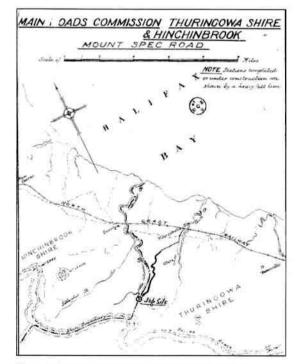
Sketch showing location of Little Crystal Creek Bridge (labelled job site).
